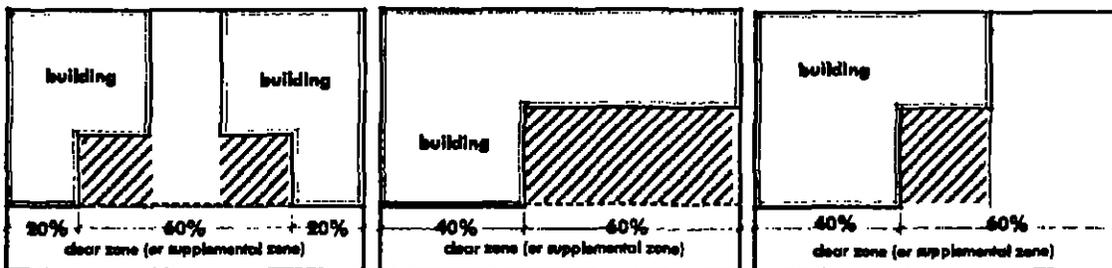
Examples of permitted building placement on urban roadways. Parking is generally not permitted in the hatched area between the street-facing building facade and the sidewalk.
